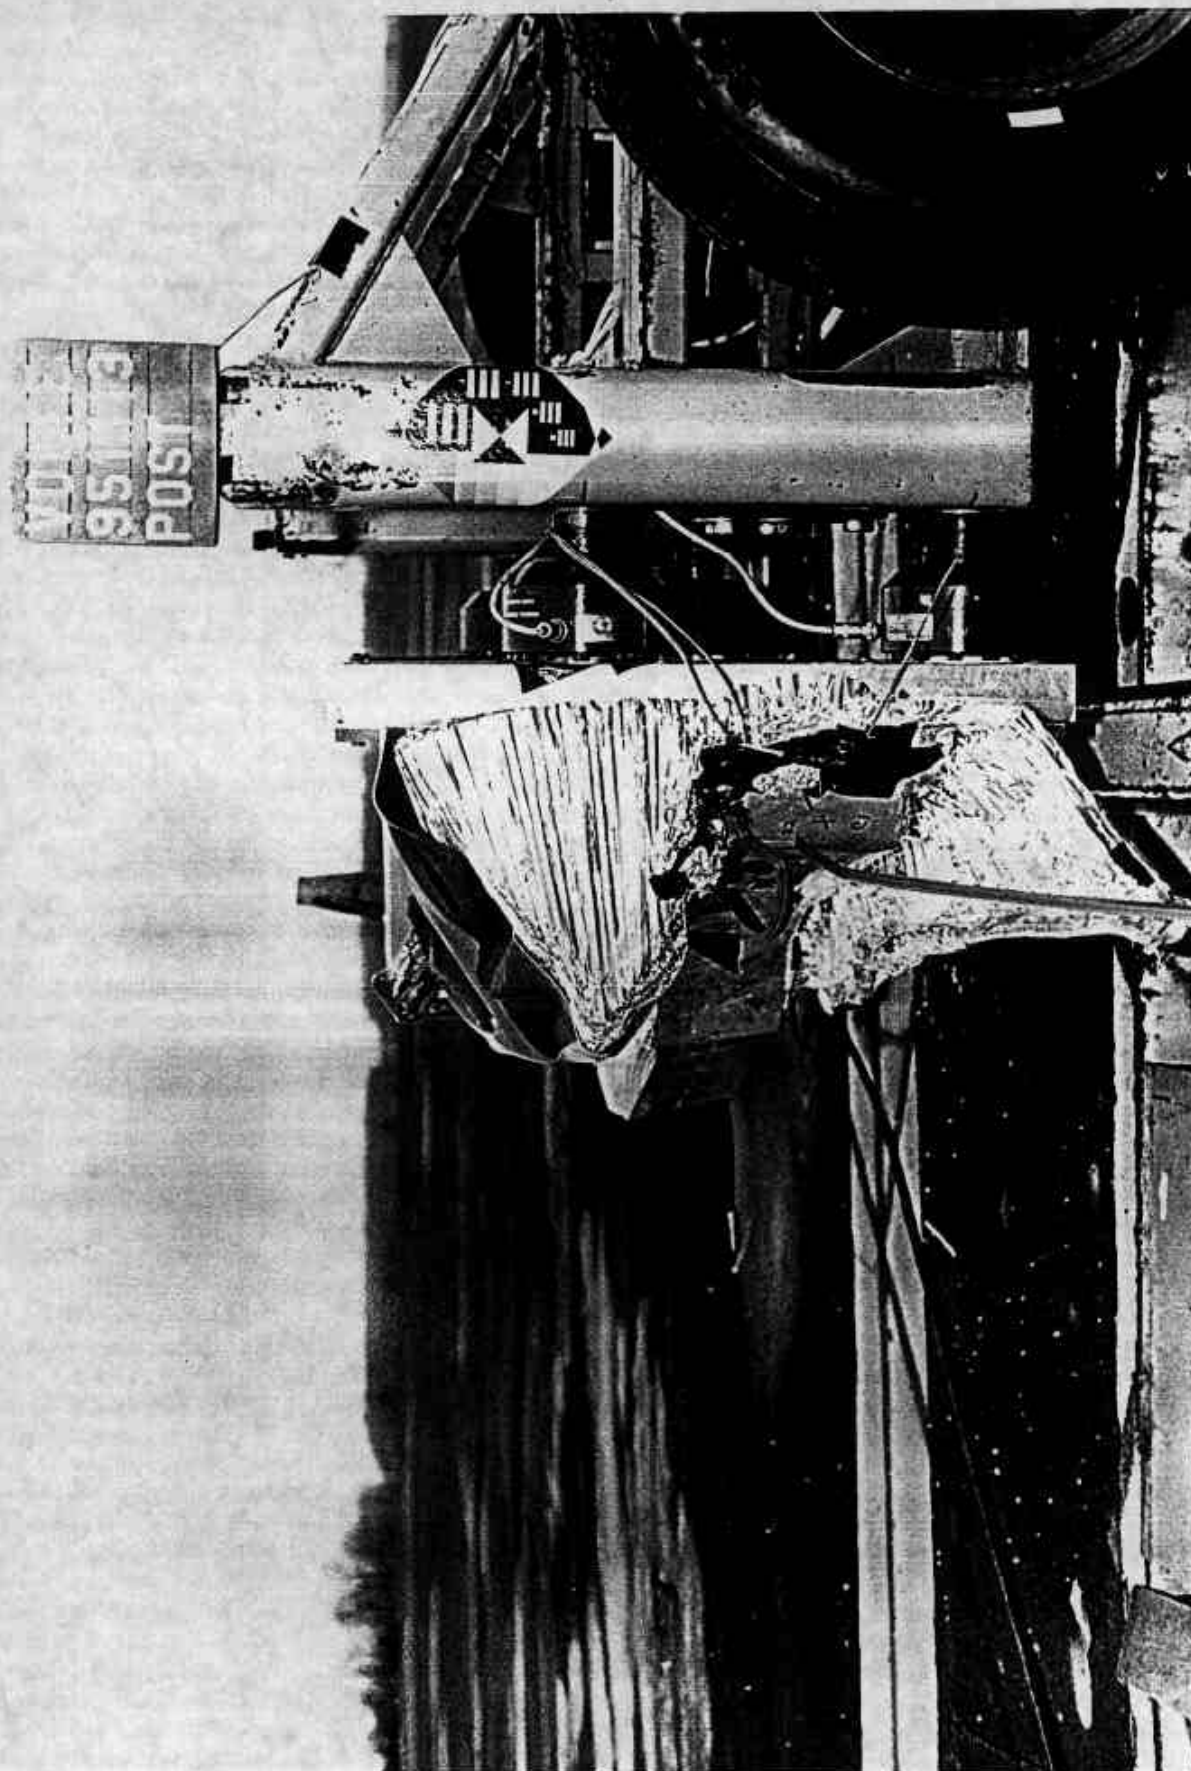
Post-Test Barrier Face Deformation View - Left Side
